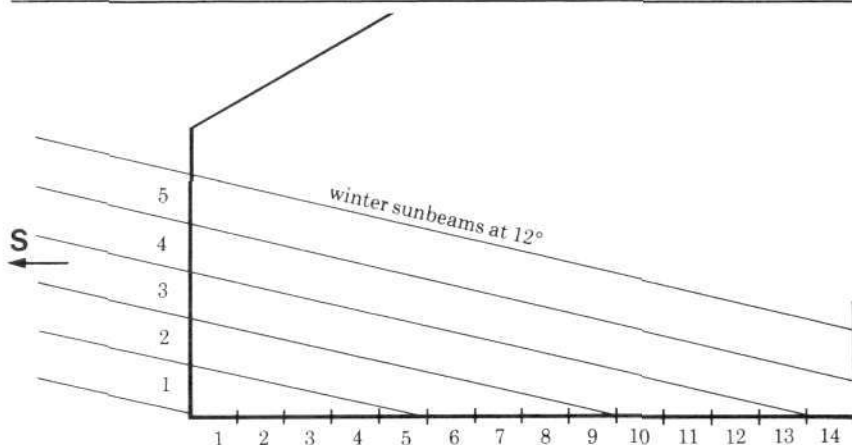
winter light transmission through the south wall of an east-west oriented greenhouse. For every 4½ units of width the south wall should be one unit high in order to make best use of the winter sunshine.
